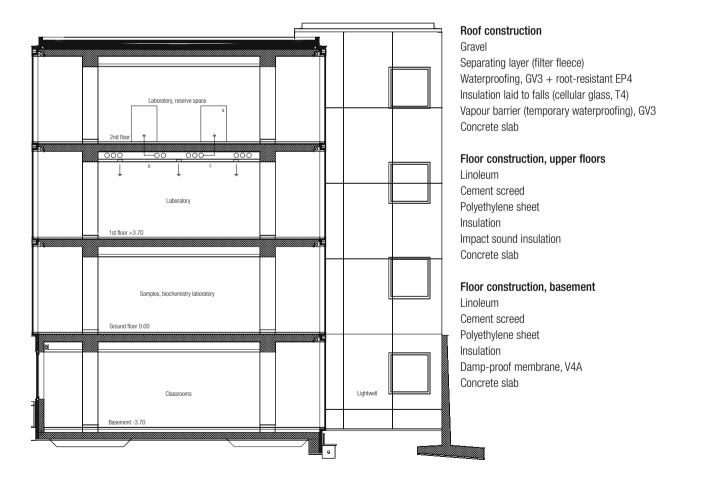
Section The stacked concrete "platforms" and staircase tower, which in the basement is coupled with the lightwell. a) Laboratory benches/media supply points; b) horizontal media zone/distribution; c) lighting unit
